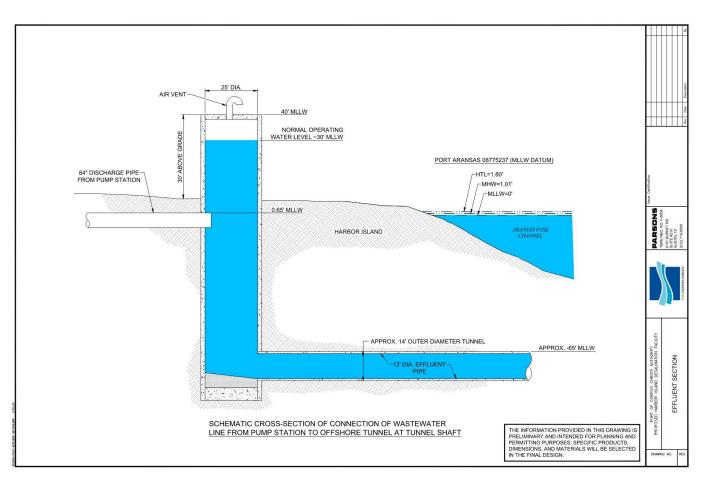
Schematic Cross-Section of Wastewater Pipe from Pump Station to Offshore Tunnel at Tunnel Shaft
